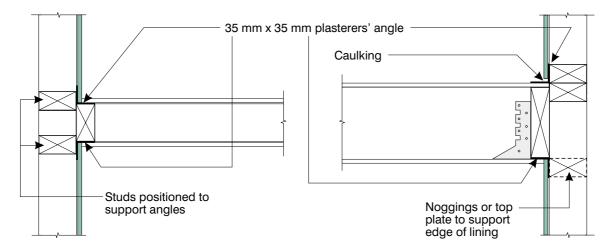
TYPICAL JUNCTIONS WITH ADDITIONAL SOLID TIMBER
